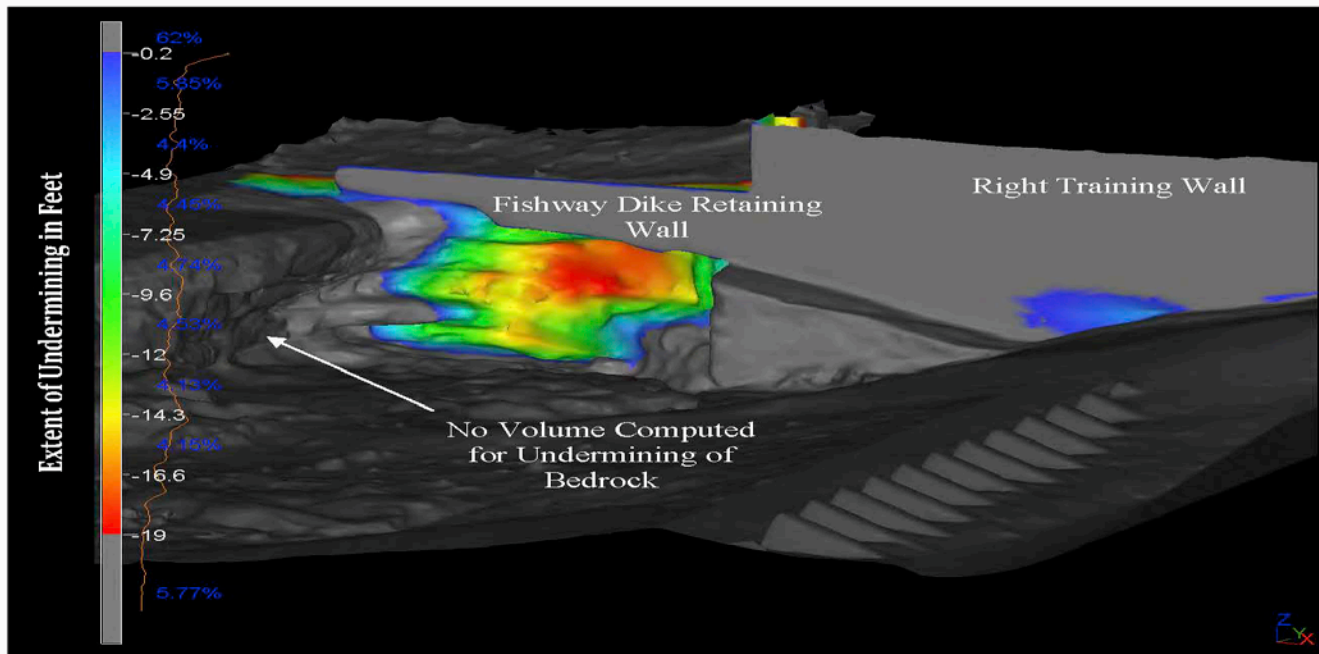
Undermining Area B, Fishway Dike Retaining Wall
